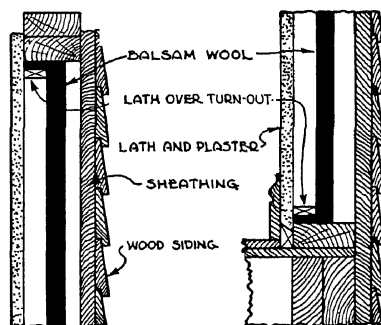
Sections of Plates and Sill in Frame Wall Showing Application of Blanket Insulation
